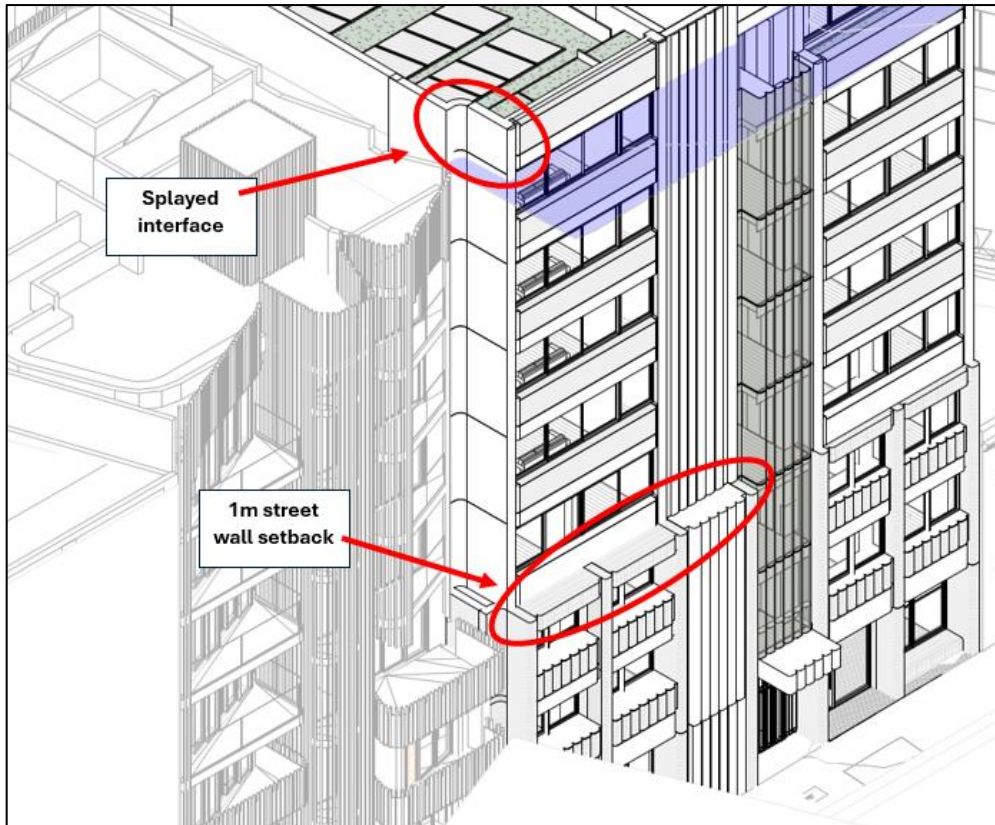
3D perspective of the Cooper Street elevation, showing the setback above the street wall, and splayed interface to No.10-14 Cooper Street
